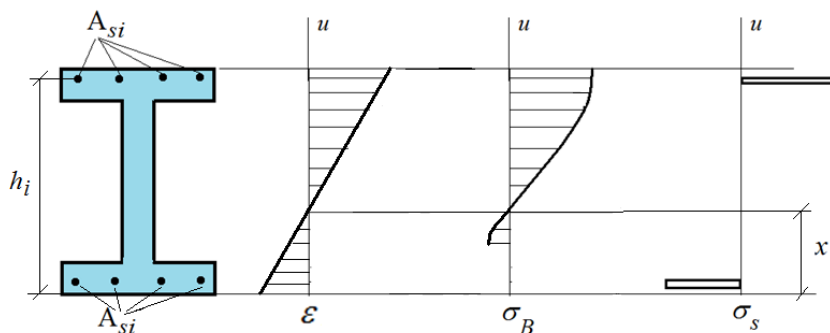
The distribution of strains and stresses in the section of reinforced concrete beam
